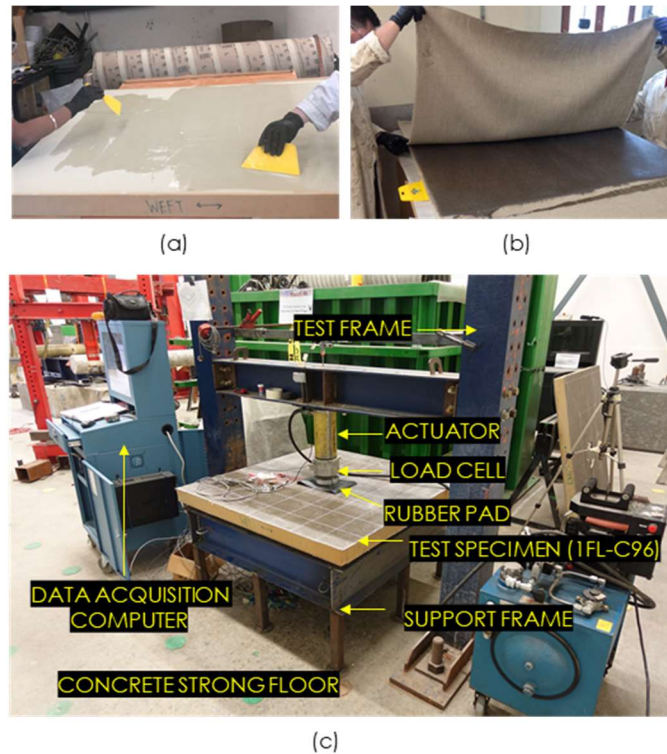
Fabrication and testing of sandwich panels: (a) applying epoxy to foam surface; (b) placing a layer of flax fabric; and (c) test set-up
